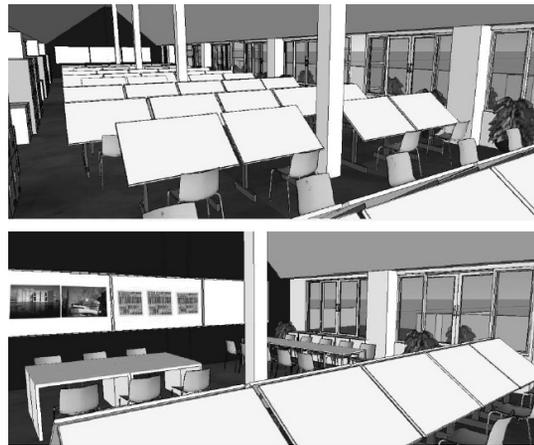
Interior Perspective AR-508 (Floor 5) studio type 1. Furniture layout design to cross of studio and circulation outside in studio
